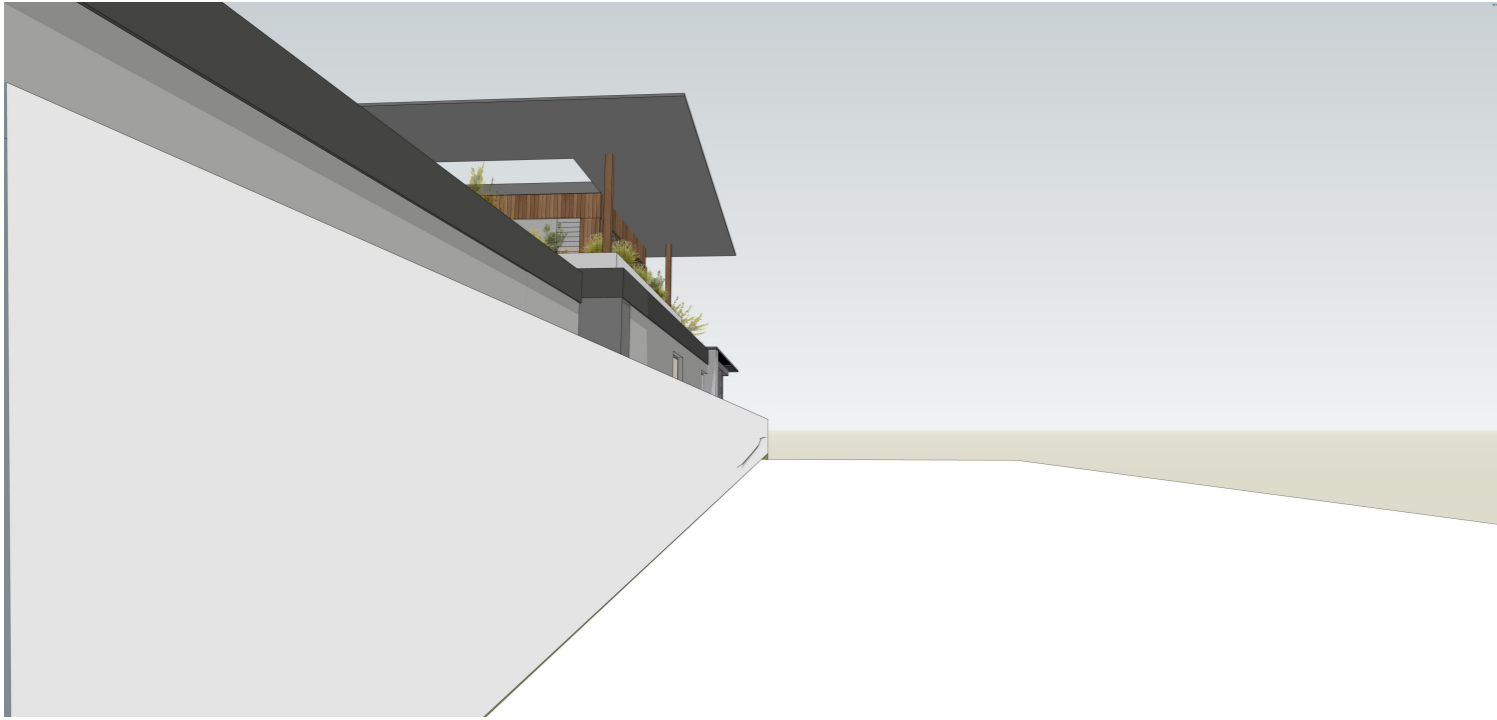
SHOWING FIRST FLOOR TERRACE AND IMPACT OF NEIGHBOUR
